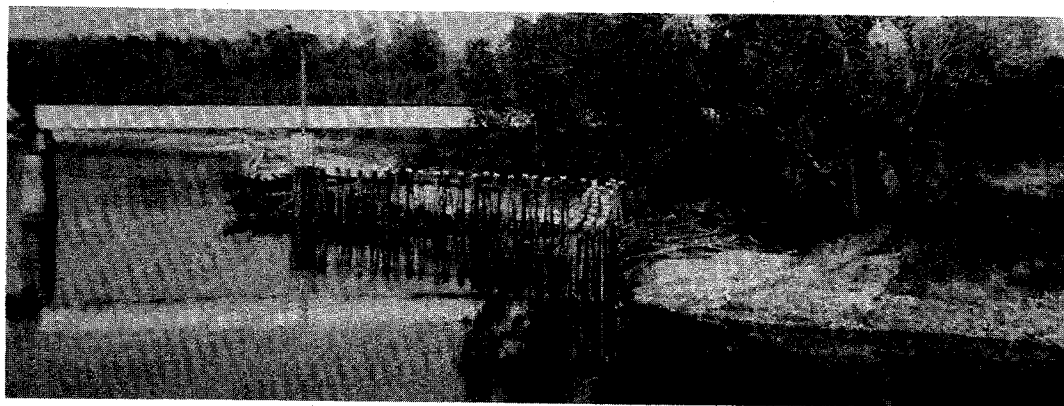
View of timber-pile retard at left bank upstream from US-82 bridge, April, 1976.
